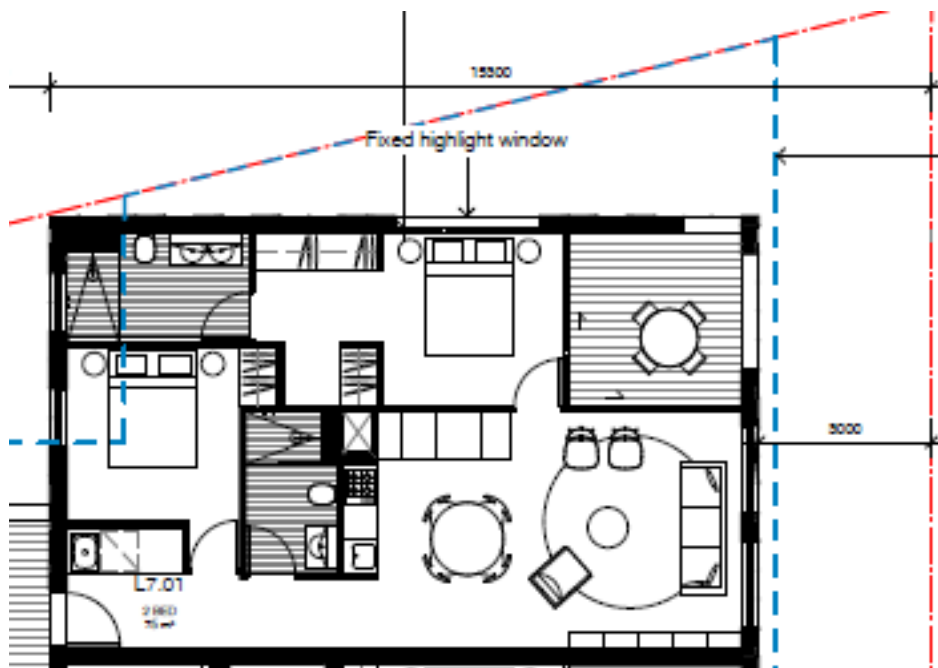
Highlight windows and only small balcony openings to apartments on levels 7-17 facing the Iglu development
